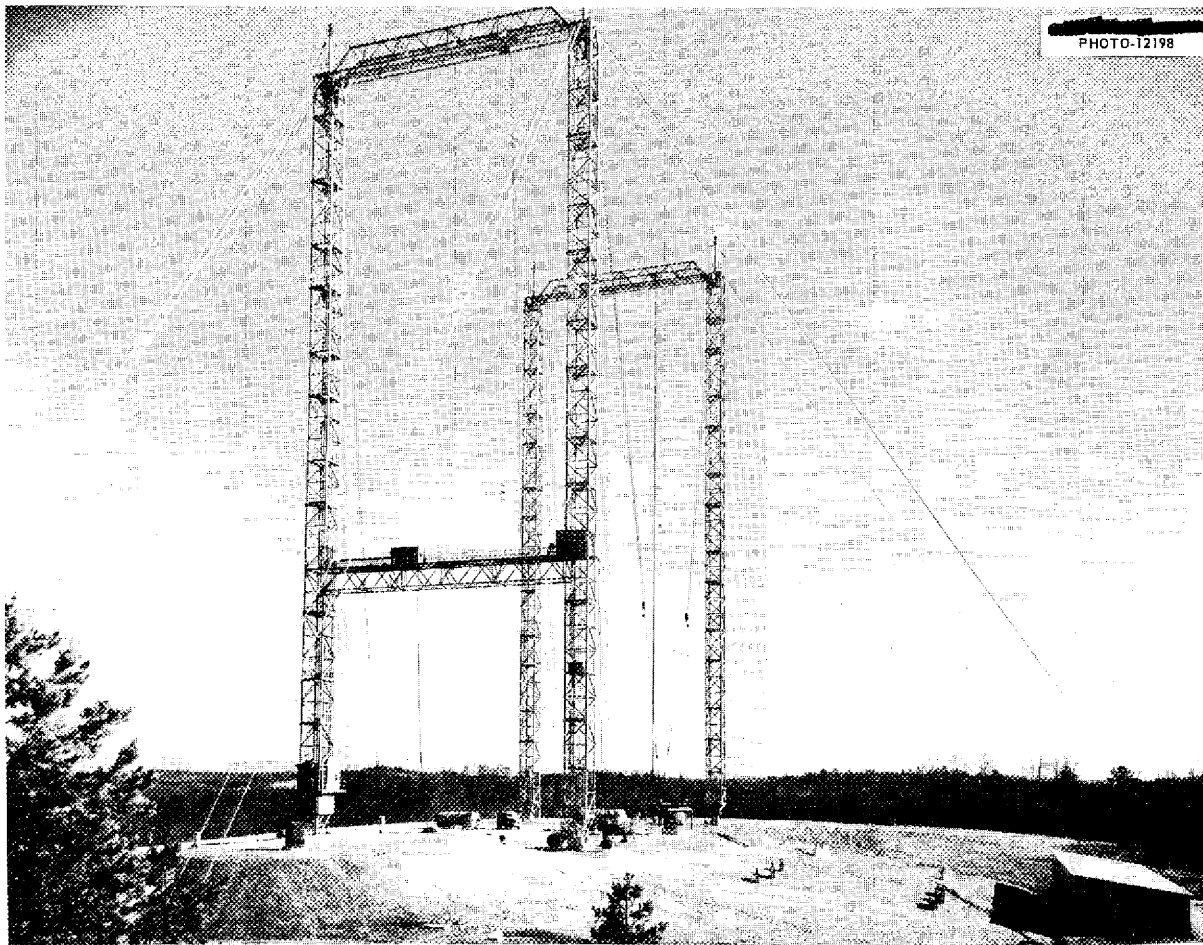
Tower Shielding Facility, February 12, 1954.
